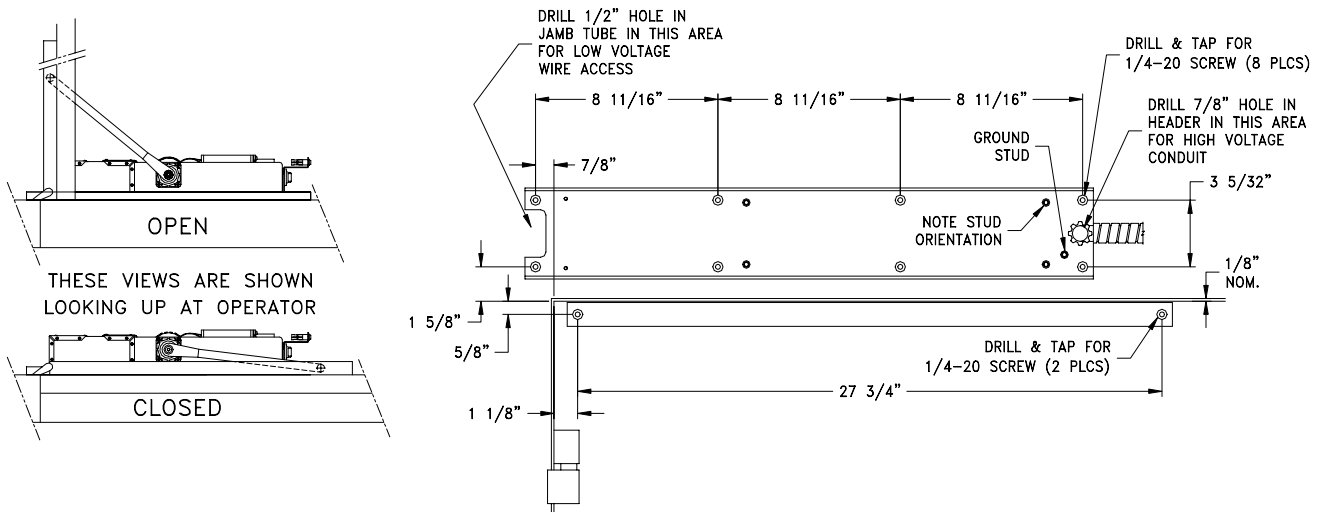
OPERATOR INSTALLATION – PULL ARM
